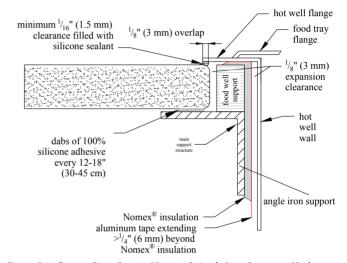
Cutout Cross Section View with Angle Iron Support - High-Strength Corner Block
